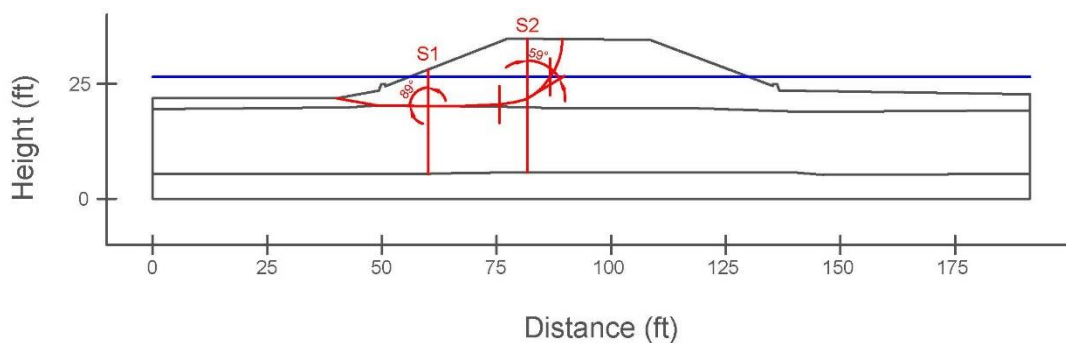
Sub-sectioning of the cross-section and failure plane for Hachiro-Gata Road Embankment
